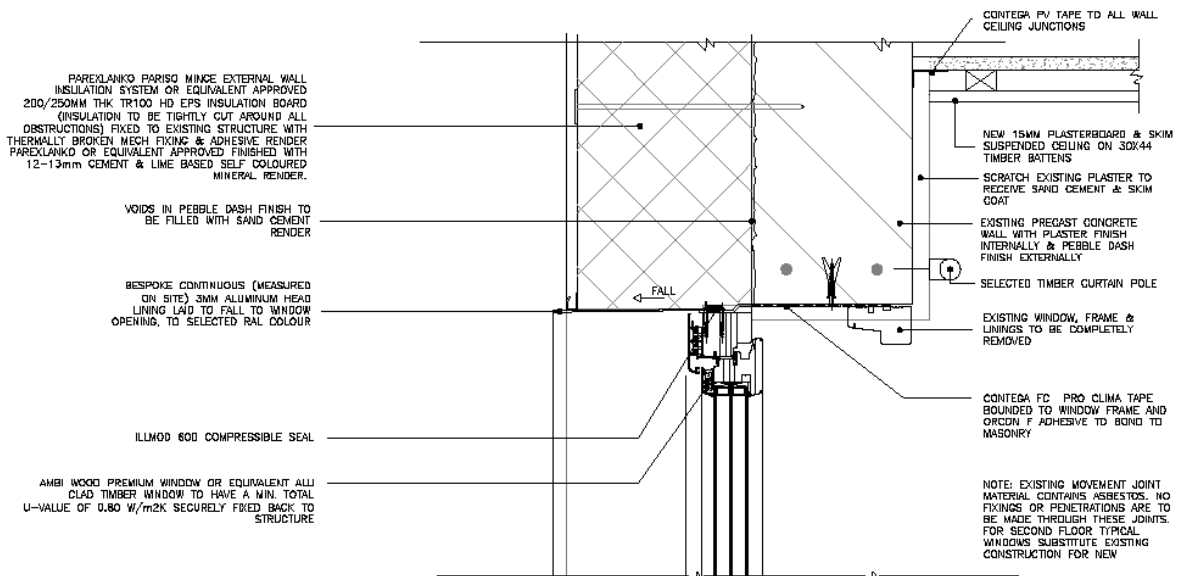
Window head detail on the existing building (not to scale) [DLR Co. Co., 2014]
